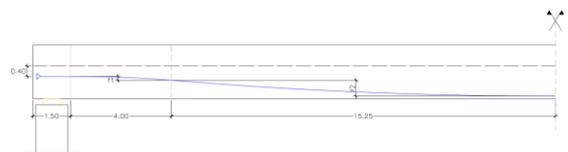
Figure 5 – Pre-stress layouts for the bottom level of anchorage in beams 1 and 2
